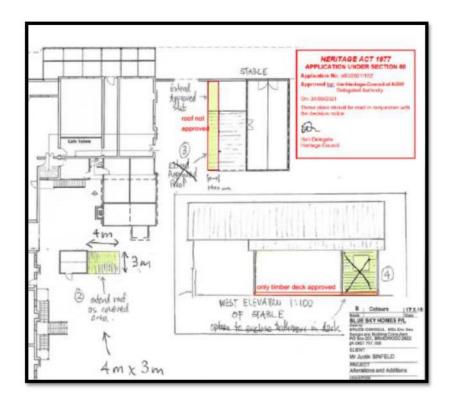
Proposed works - roof to brick store, timber deck and slab to stables
